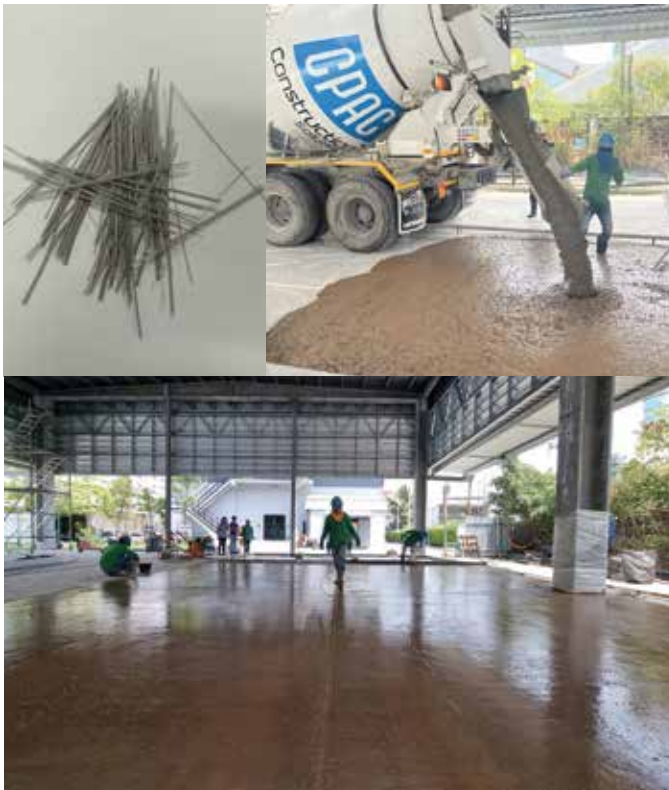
Fibers used in LC3 concrete and casting fiber-reinforced LC3 concrete
